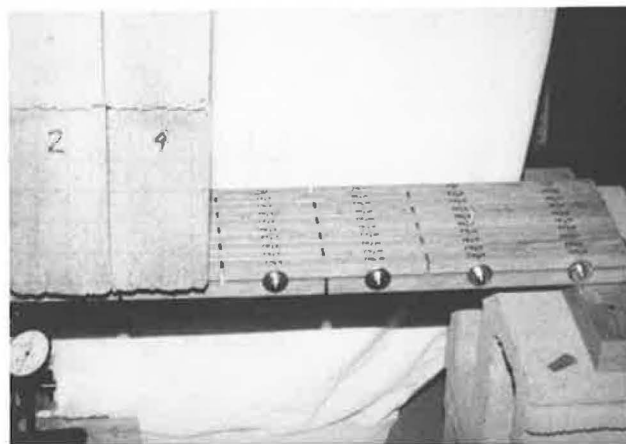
Right half of bilayer model bridge under load and showing butt joints.
